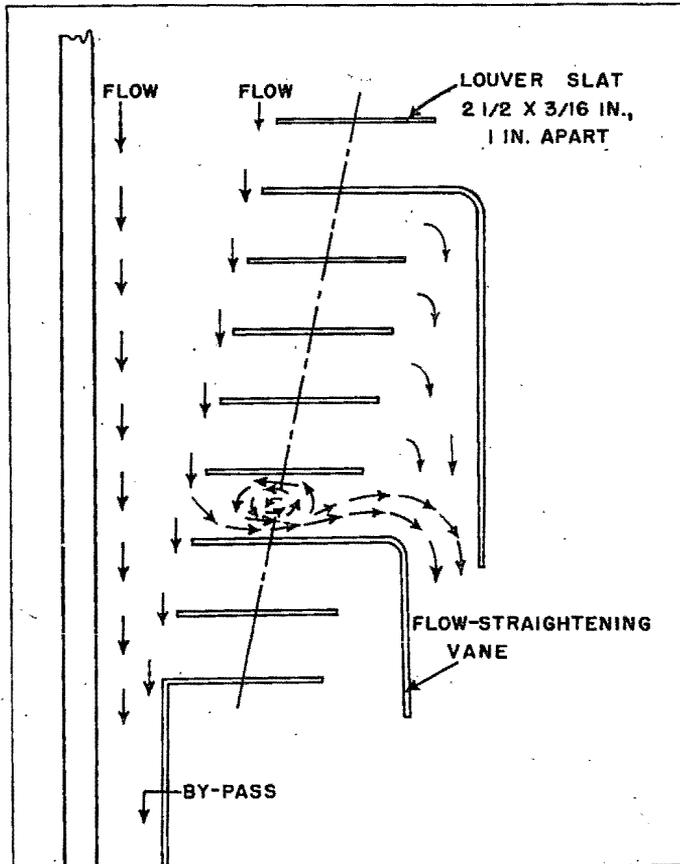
Detail of louver slats used at the Tracy pumping plant. (From Anon., 1957.)
